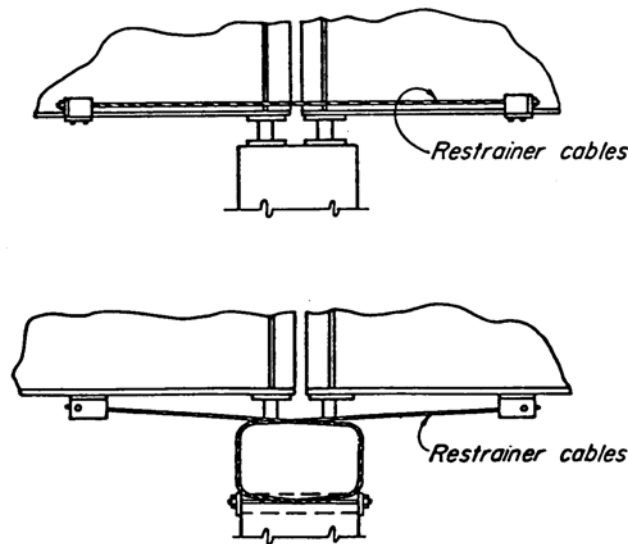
Typical Cable Restrainer
